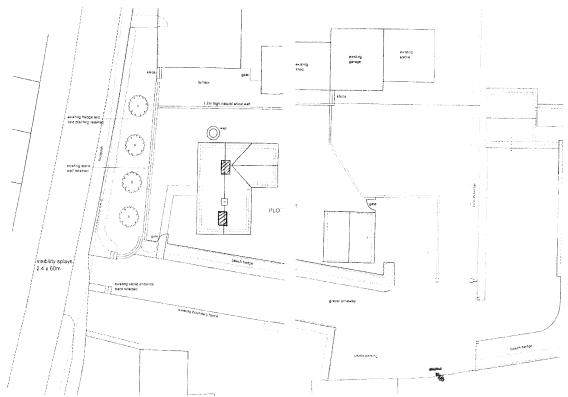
Proposed development at Barnetts Farm, Church Road, Egleton, Rutland with location of proposed test-pits
